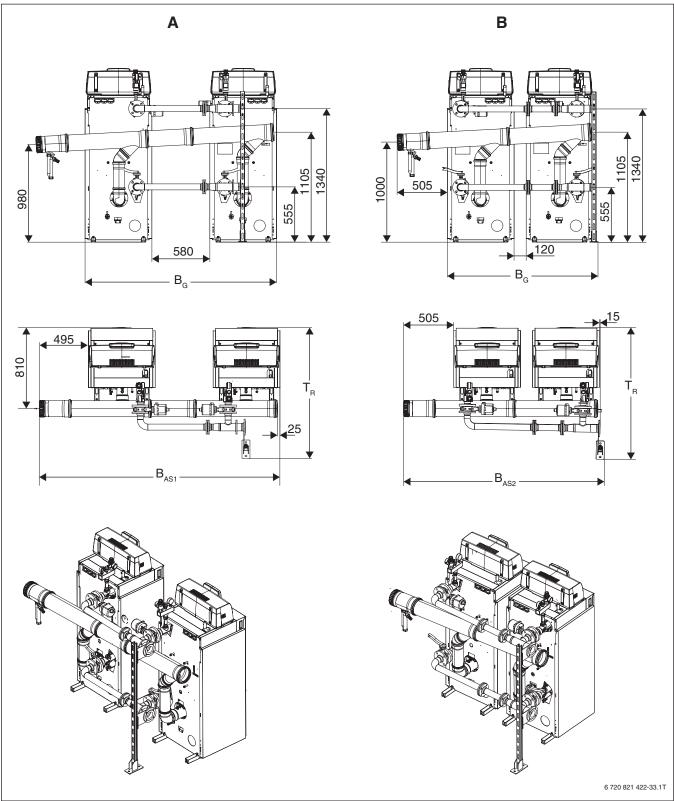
Dimensions Logano plus KB372, 2 × 75 and 2 × 100 kW – factory-prepared 2-boiler-cascade with motorcontrolled hydraulic butterfly valve; (dimensions in mm)
